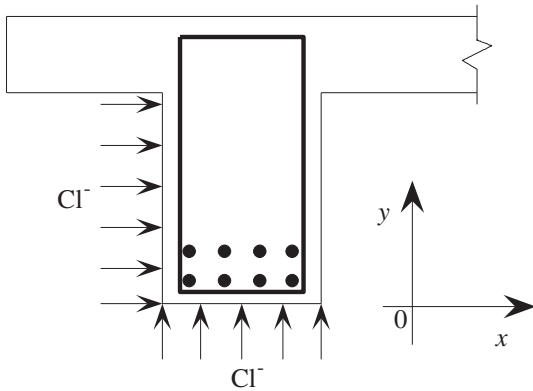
Damage scenario for chloride ion penetration into bridge beam.
